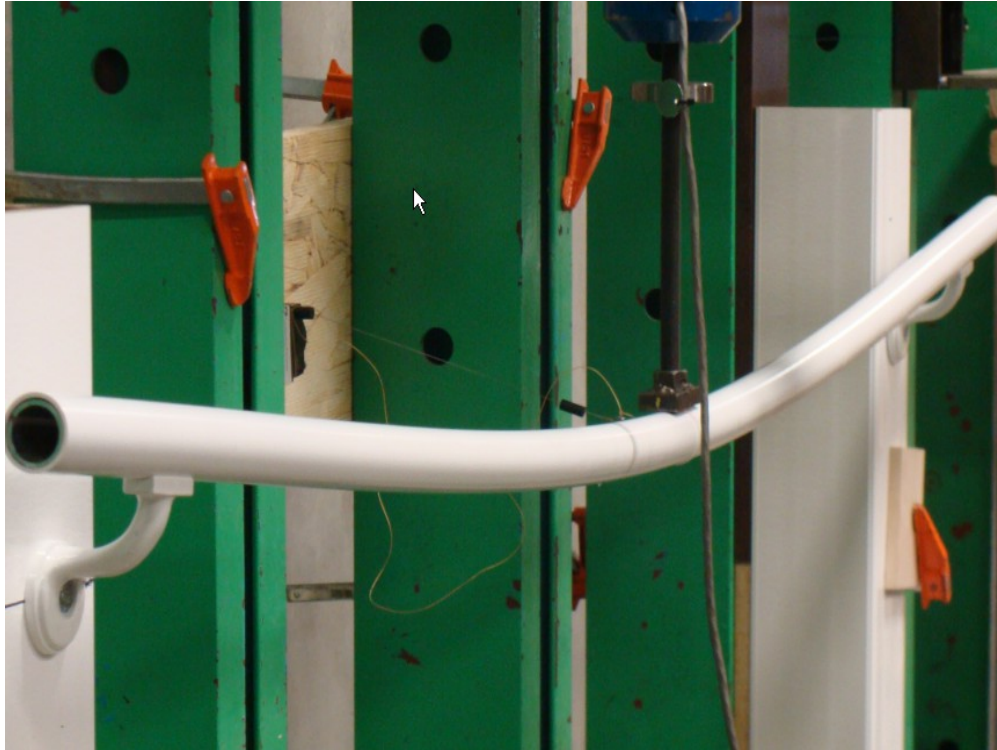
200 lbf Load Applied – Vertical Midspan
